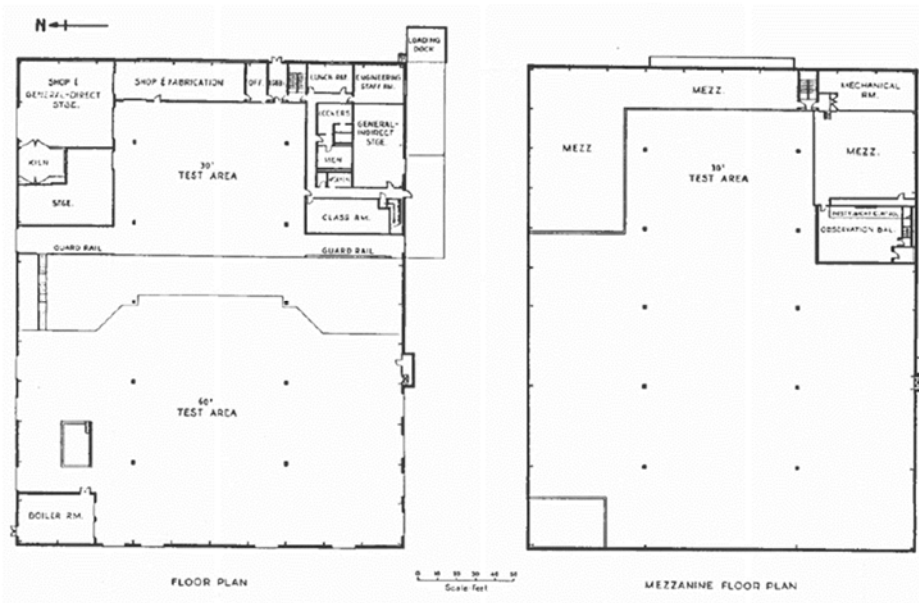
Factory Mutual Test Center – Plan View (historical image)
